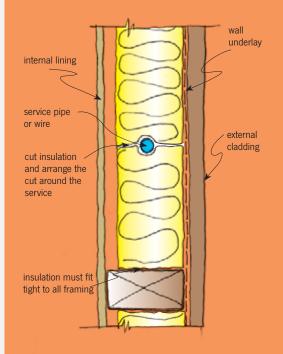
Cutting and installing insulation around a service pipe or wire. 115 mm wall framing shown with 90 mm thick insulation. Installing thicker material would have been better.
